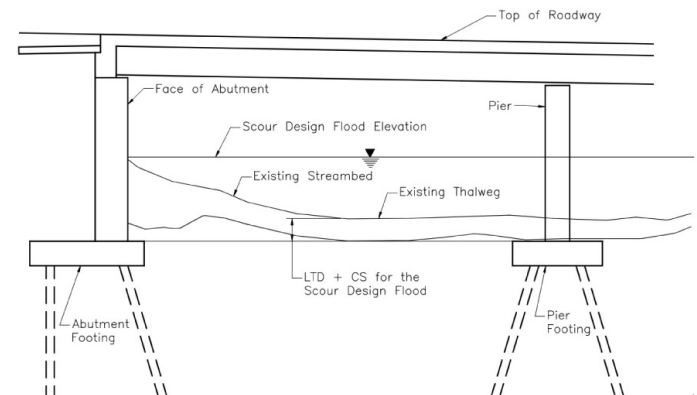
Scour Placement of Footings for Deep Foundations
